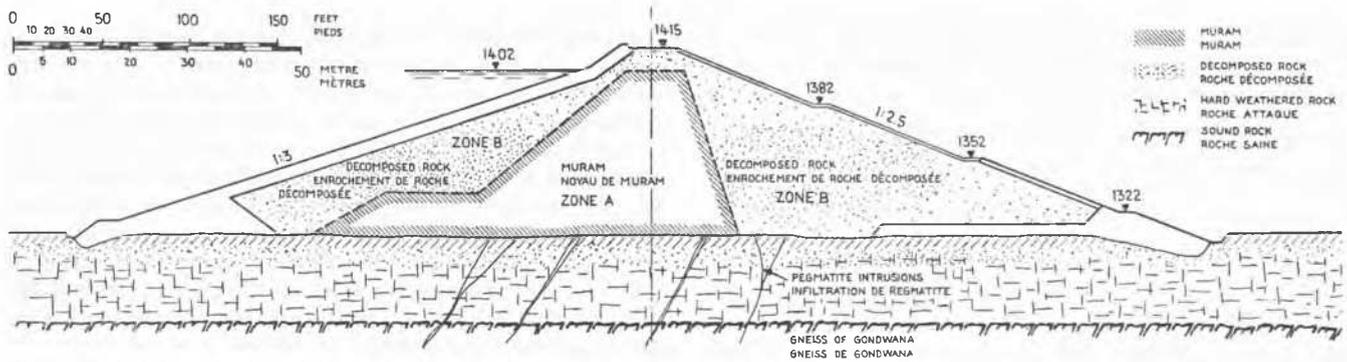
Typical Cross-Section of the Earth Fill Section type
